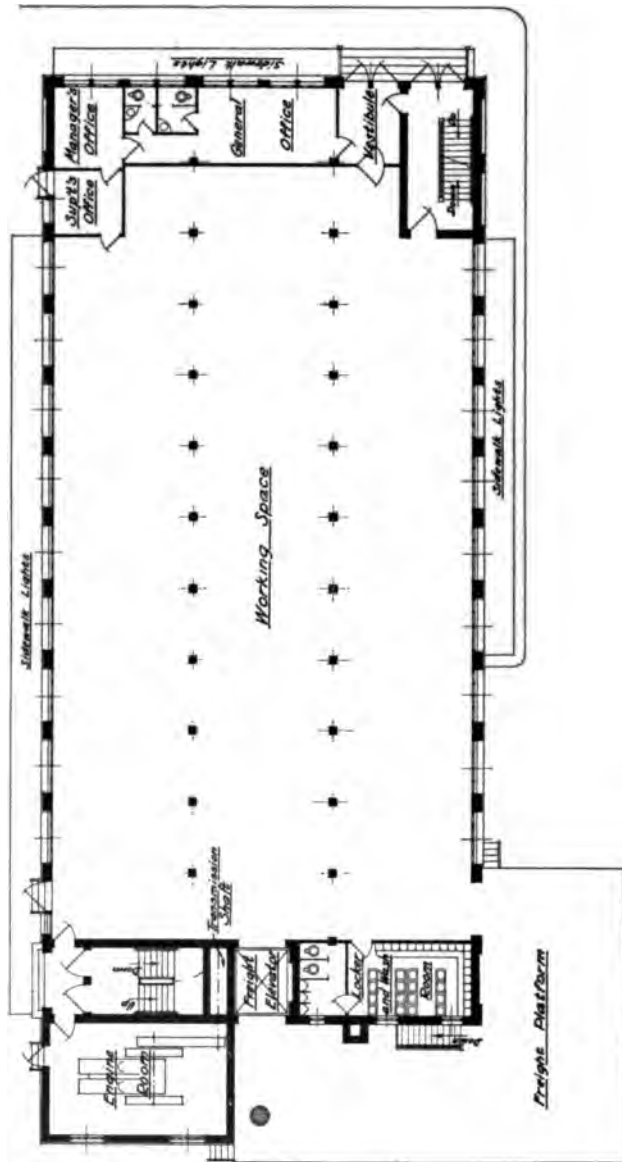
FACTORY BUILDING MILL CONSTRUCTION. FIRST FLOOR PLAN
